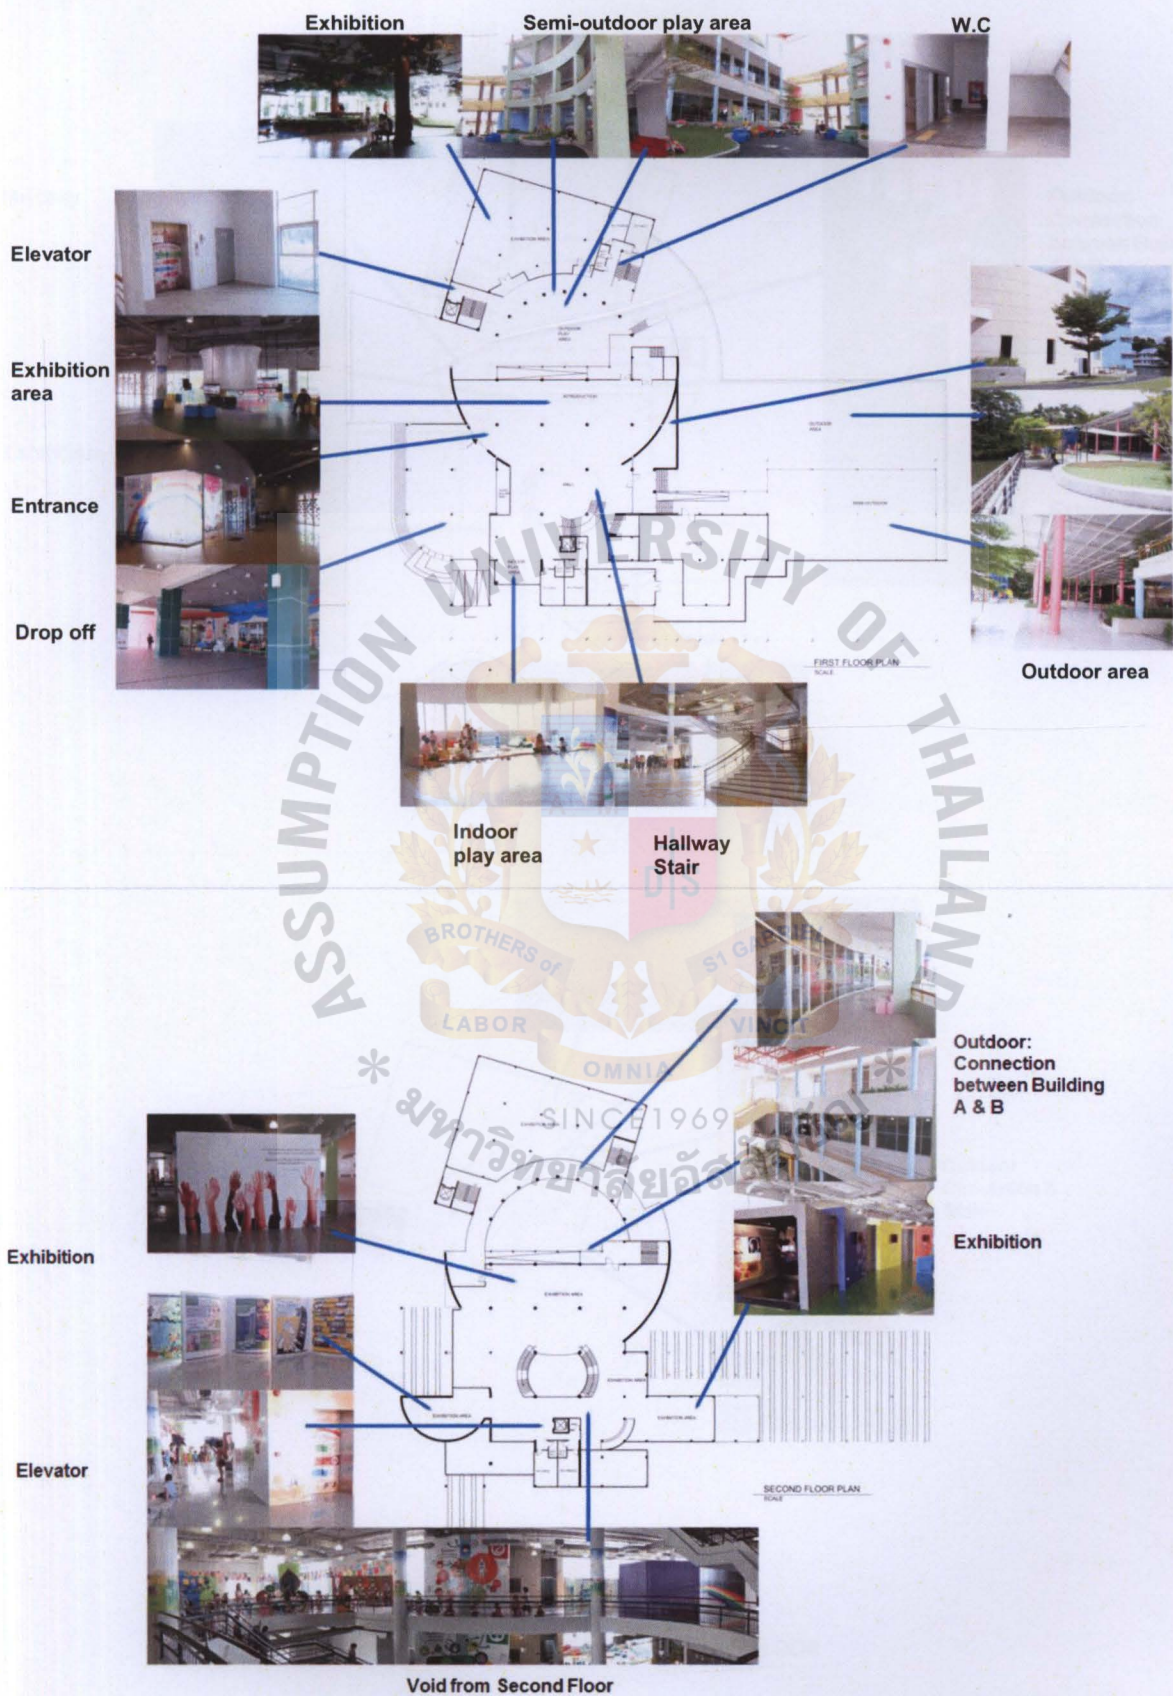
EXISTING BUILDING FIRST & SECOND FLOOR
